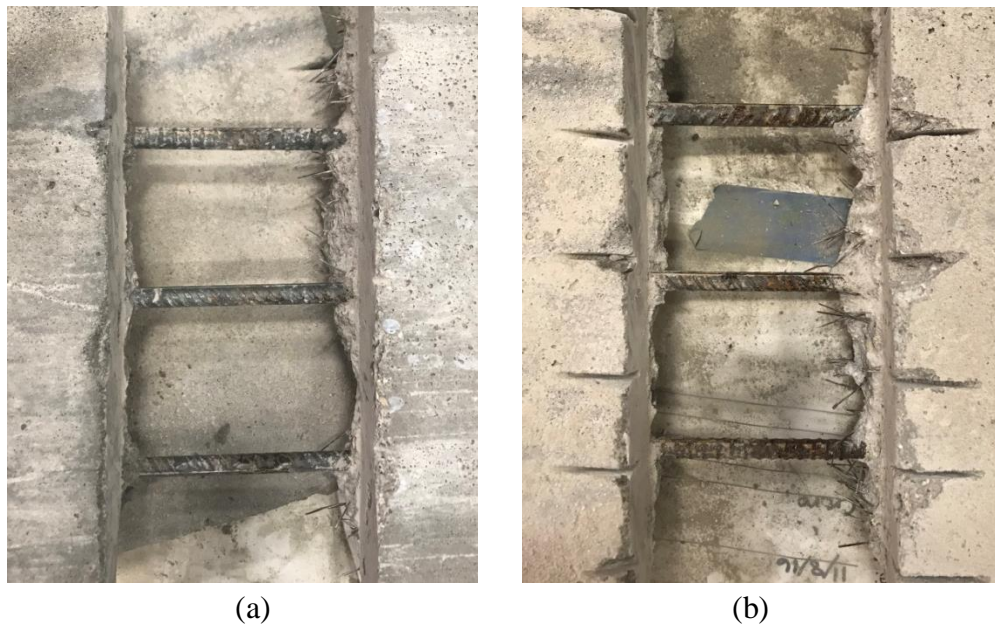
Corrosion State of Rebar Reinforcing at Joint of Phoscrete Small-Scale Corrosion
